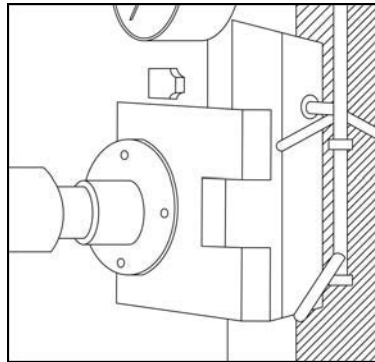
The bolt-tension calibrator is a hydraulic load cell which measures bolt tension created by tightening. As the bolt or nut is turned, the internal bolt tension or clamping force is transmitted through the hydraulic fluid to a pressure gauge which indicates bolt tension directly in pounds. The dial of the gauge may be marked to show the required minimum tension for each bolt diameter. (See Bolt Tension Table as published in the current Research Council Specifications.)
